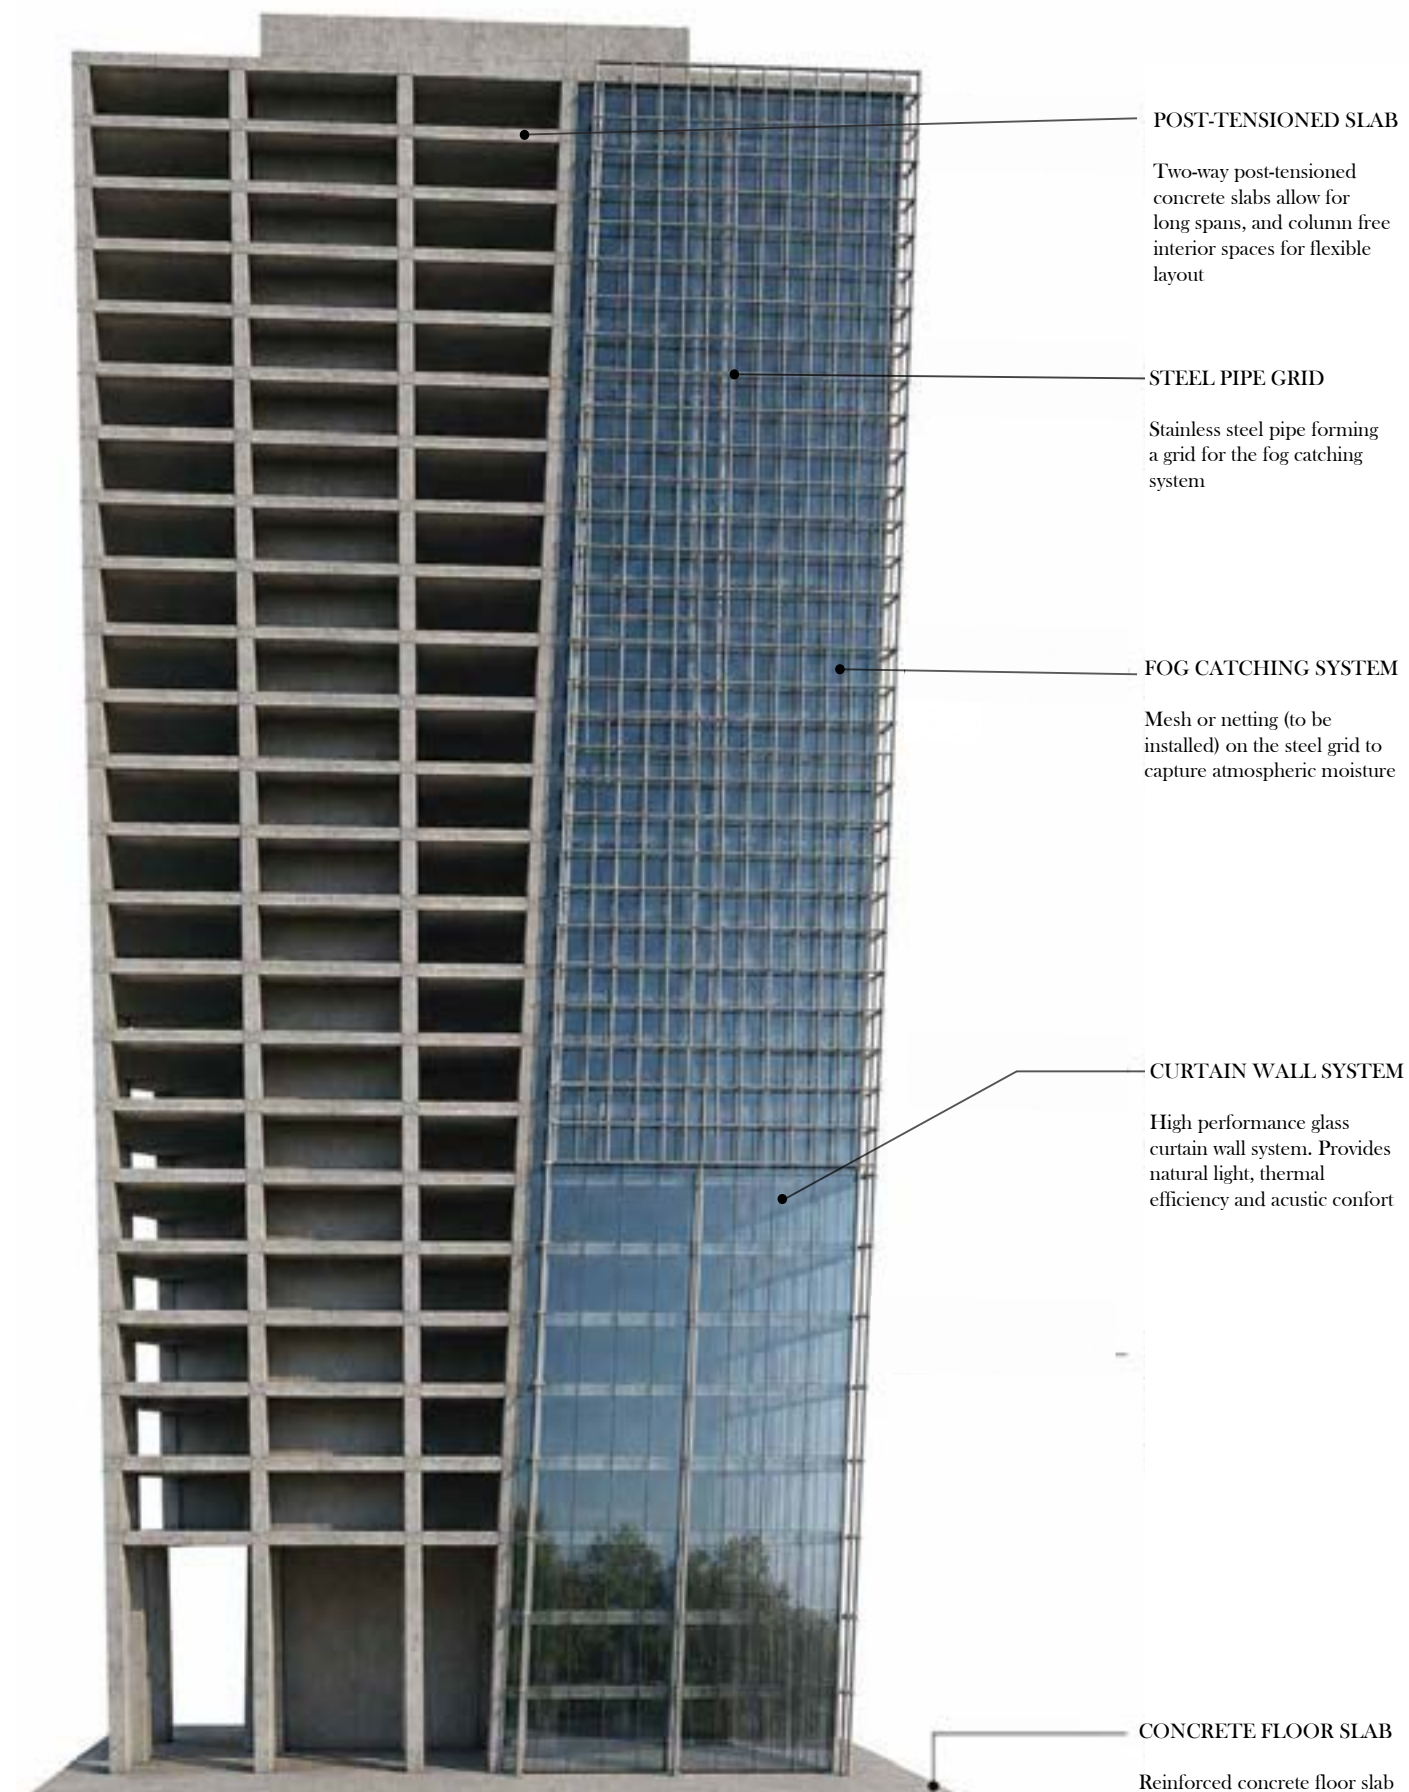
Proposed modular façade system attached to the existing Torre Banco de la Nación structure. The intervention consists of a stainless-steel pipe grid supporting a fog-harvesting mesh installed beyond the existing curtain wall, enabling atmospheric water collection while maintaining access to the building envelope. Source: Author
